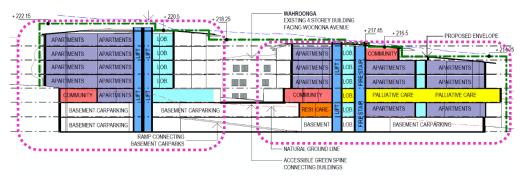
A portion of the proposed section through the site from north to south, looking west, showing how the new proposal has been designed to take into consideration the existing topography of the site. The two separated forms are indicated by the pink outline. (Source: Bickerton Masters Architecture)
